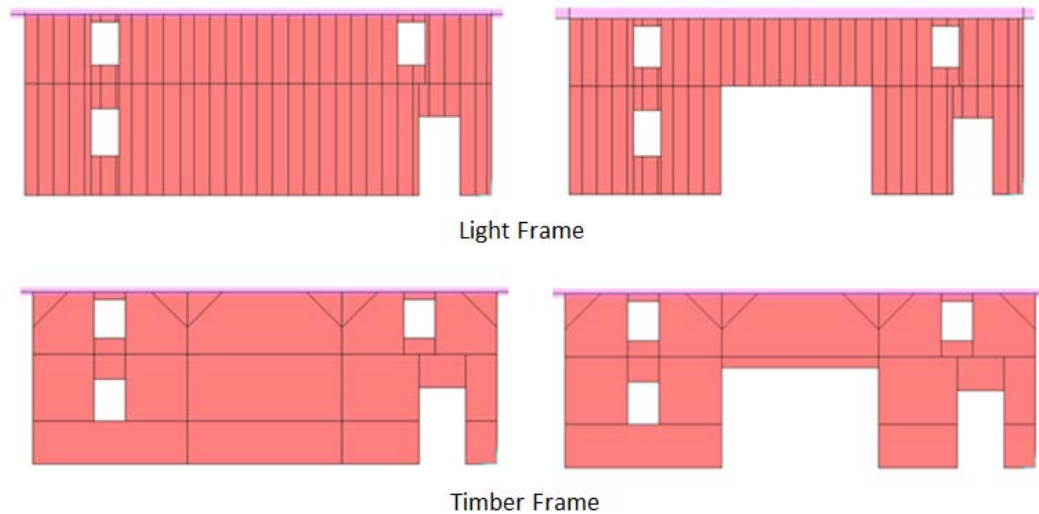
Large side opening introduced to the light-frame and timber frame
